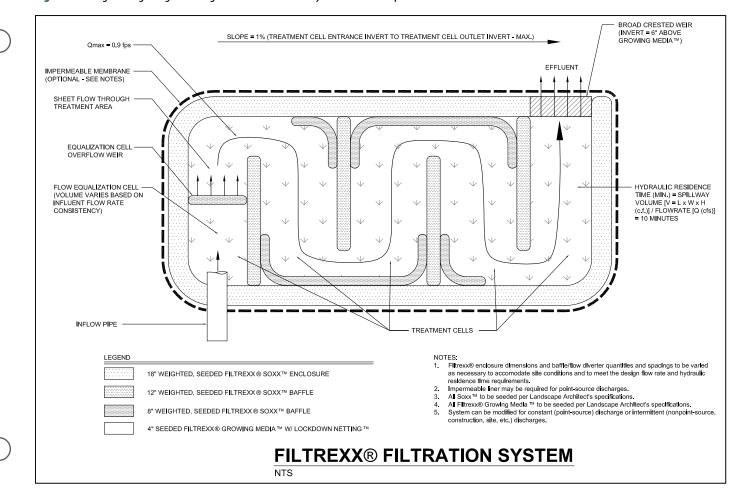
Engineering Design Drawings for Filtrexx Filtration System - Sinuous Option
